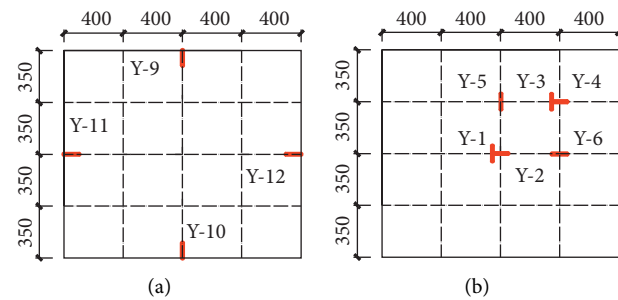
Layout of concrete strain gauge: (a) top of the slab; (b) bottom of the slab.
